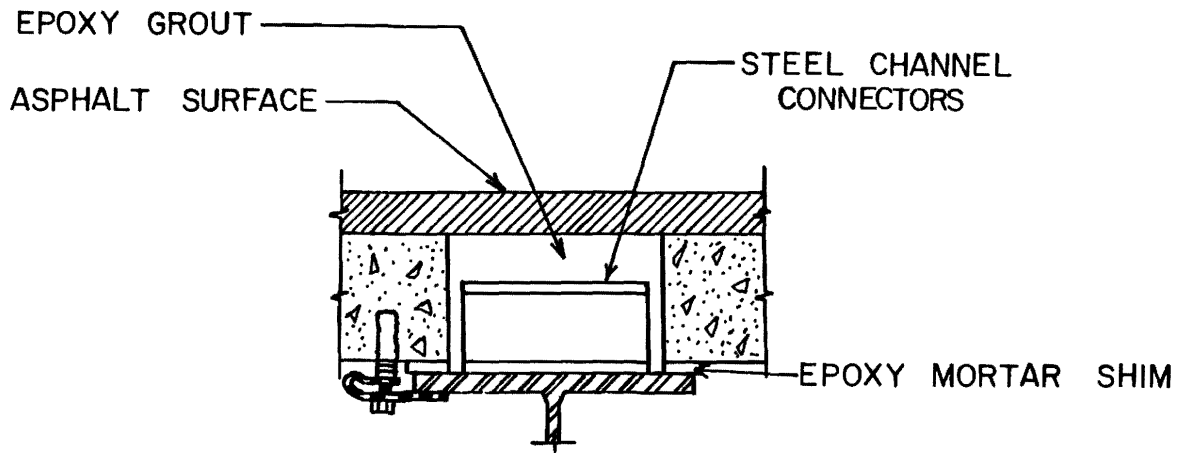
Welded Channel Connection Details, Amsterdam, New York. New York Thruway Authority (2).
